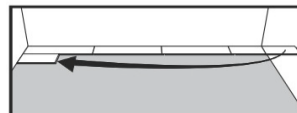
Starting the Second row First plank should be a min length of 300-500 mm. Put a 12- 15mm spacer against the wall and measure the last piece. If it is shorter than 500mm a new starter piece should be used. Drop or insert the plank at an angle into the previous row and tap (on the long side) it in using a tapping block till flat.
